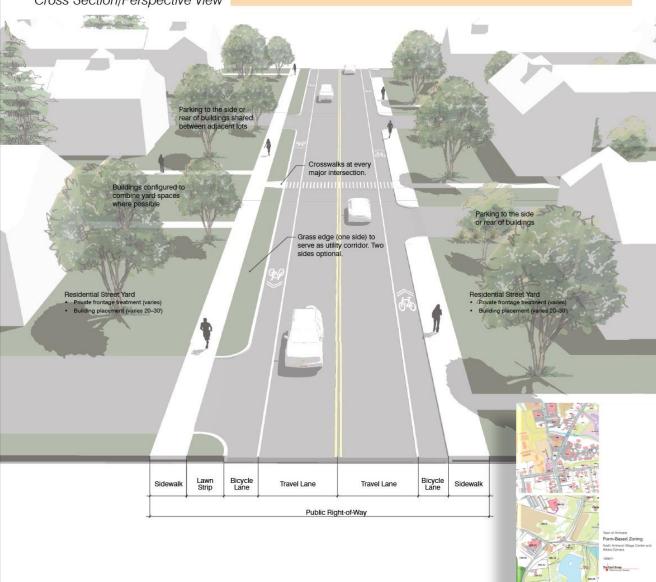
STREET TYPES - VILLAGE RESIDENTIAL STREET TYPE
